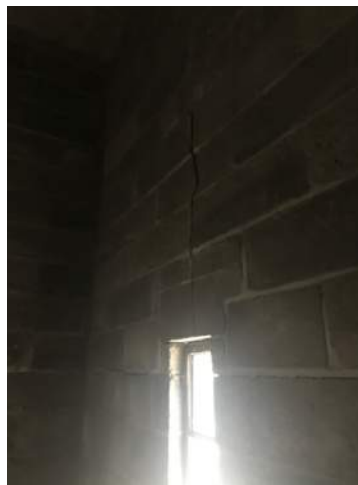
Interior South East Stairwell vertical crack at Lintel
